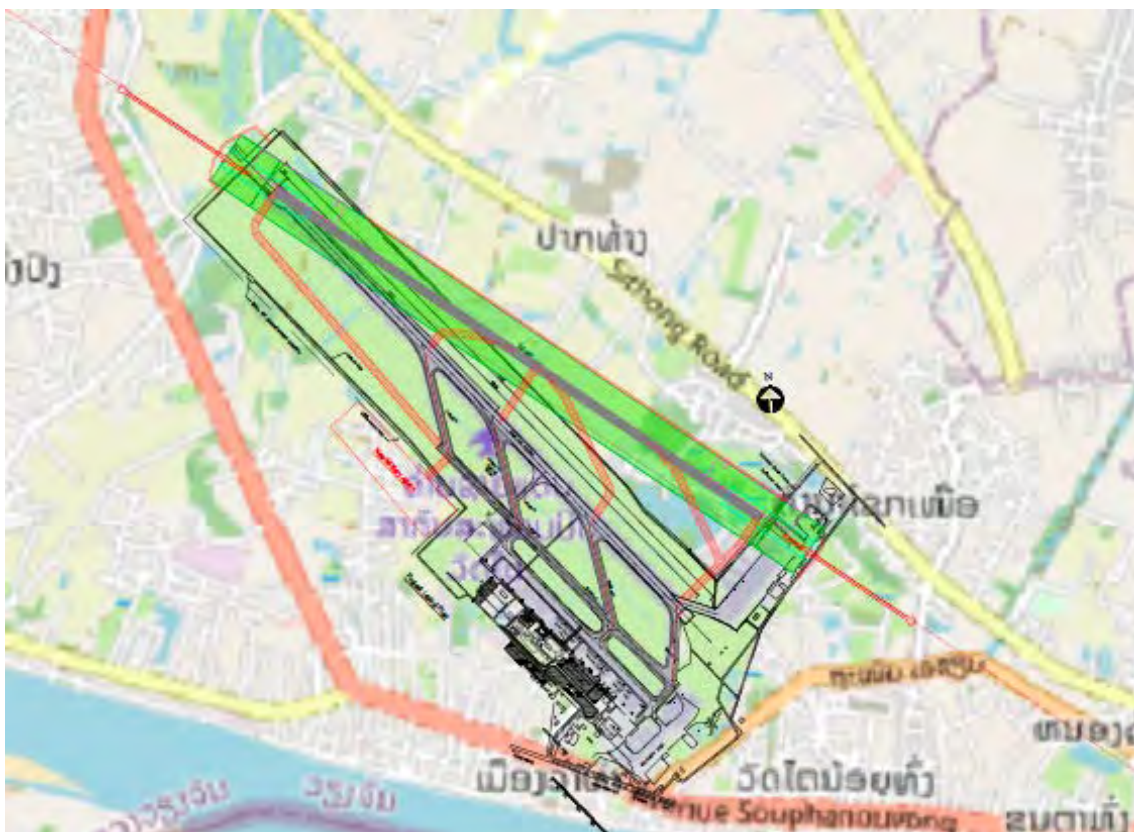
Alternative Plan to Develop the New Runway on the North Side
